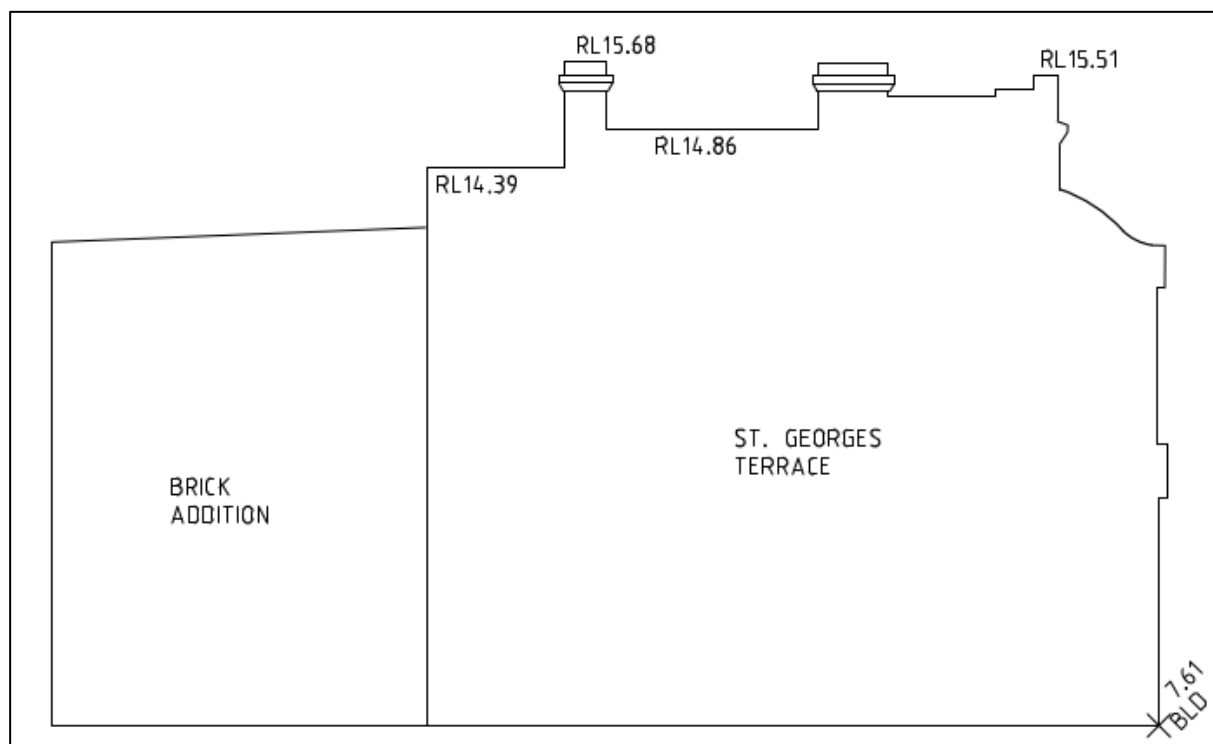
West elevation of St George's Terrace showing the intrusive brick rear addition (Source: LTS Lockley, 2020).
